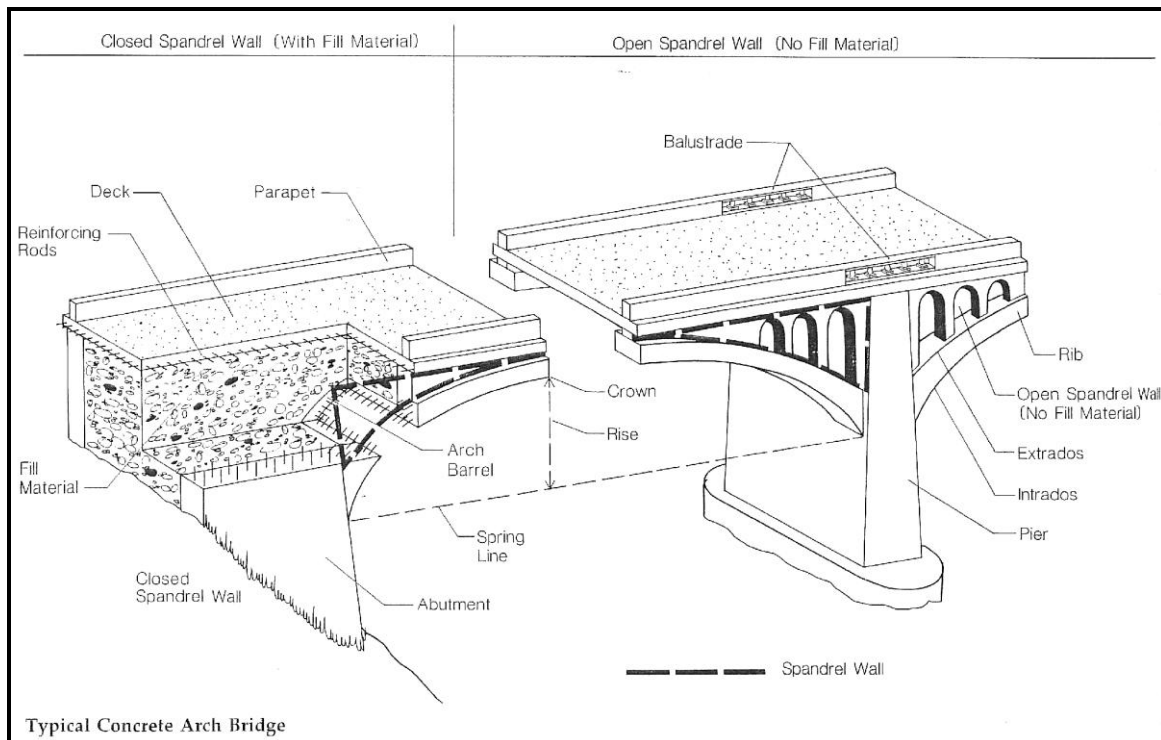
Typical Example of the Construction Methods of a Concrete Arch Bridge³¹⁸
